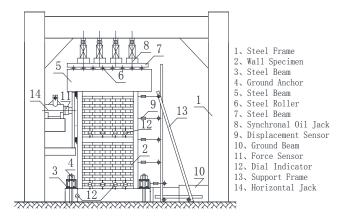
EXPERIMENTAL FACILITY OF WALL SPECIMEN
